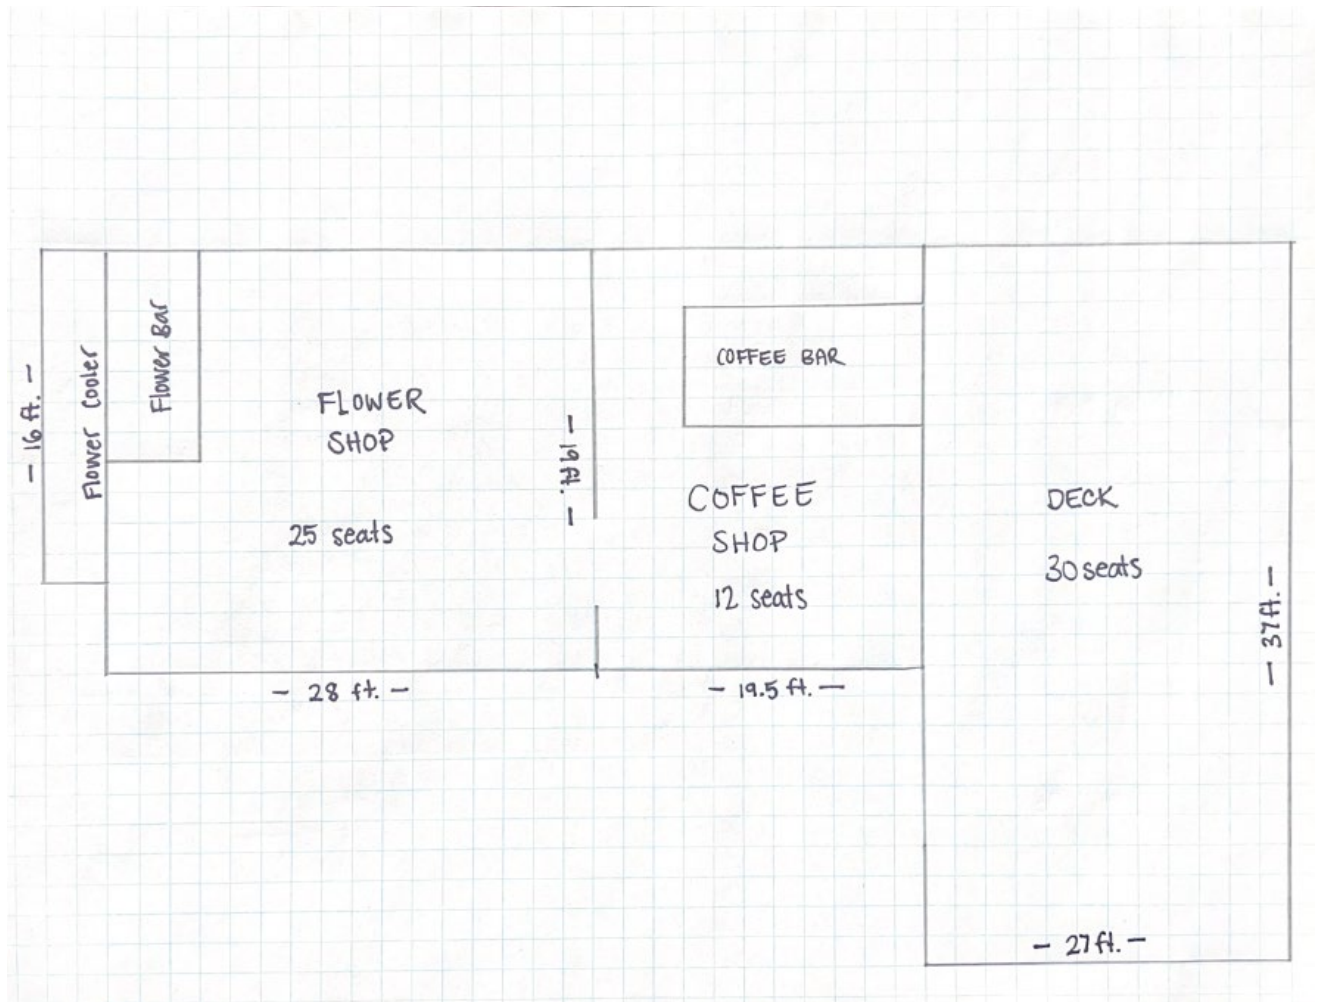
Flower Shop/ Coffee Shop Building and Deck Layout
